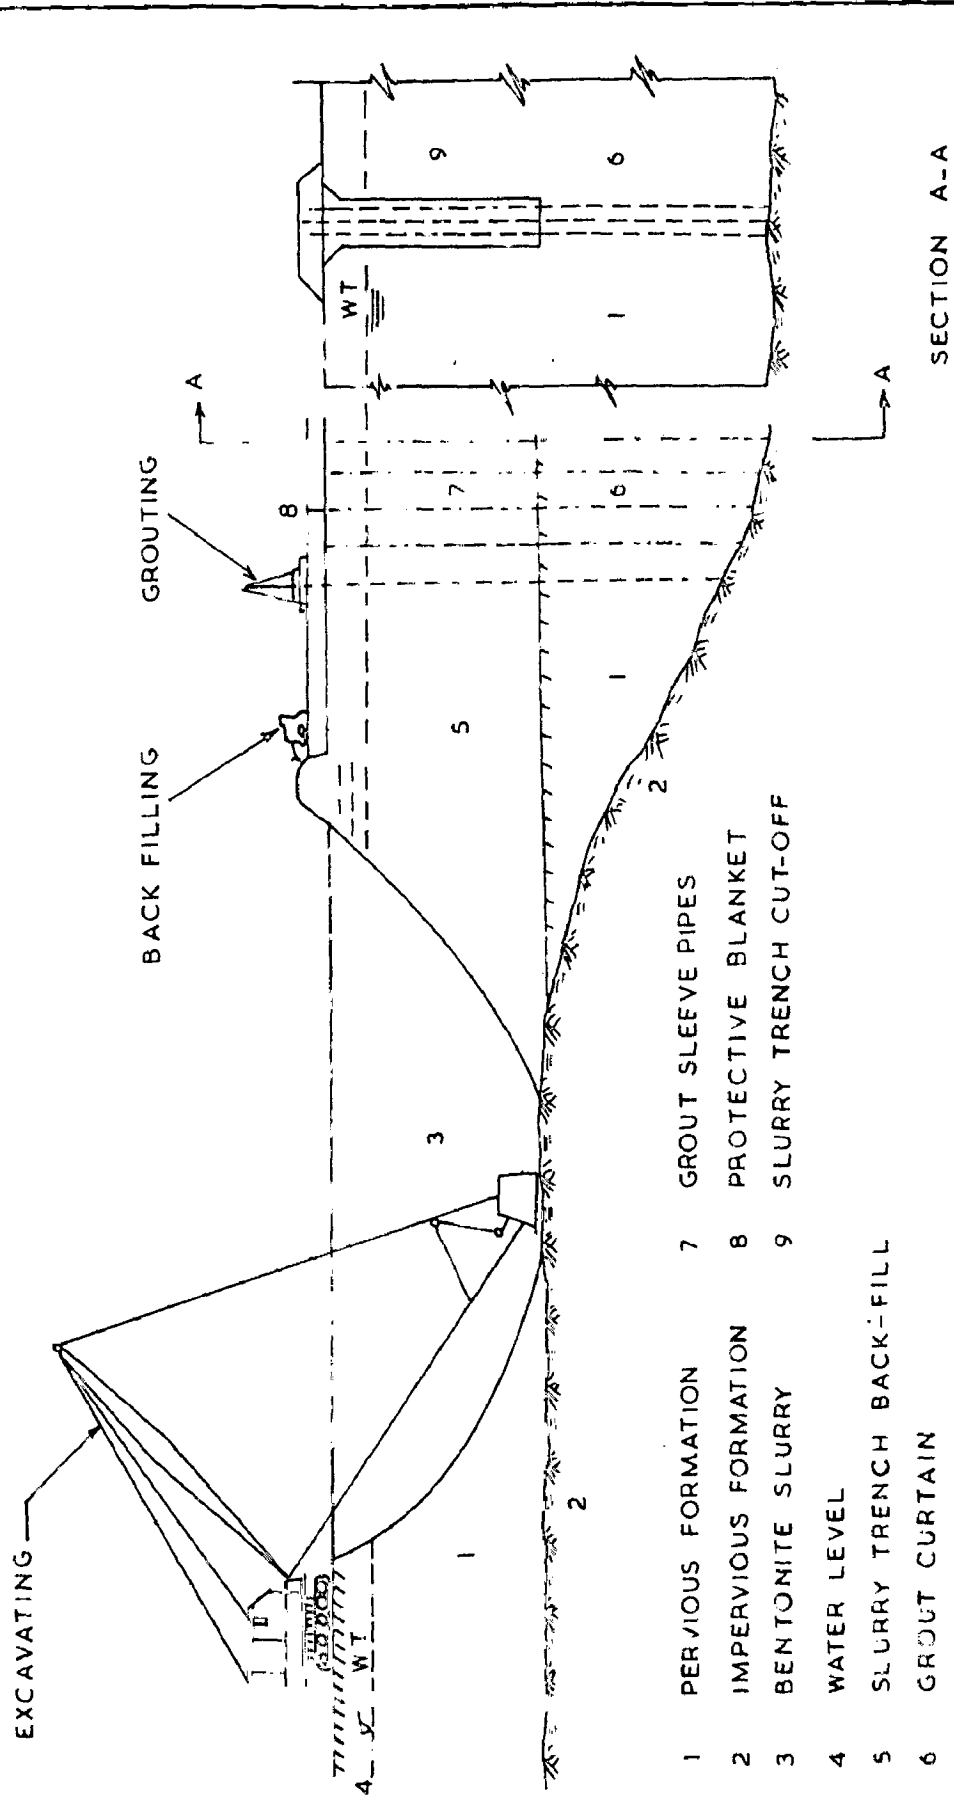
AMERICAN METHOD OF CONSTRUCTING SLURRY TRENCH CUT OFF WITH GROUT CURTAIN
